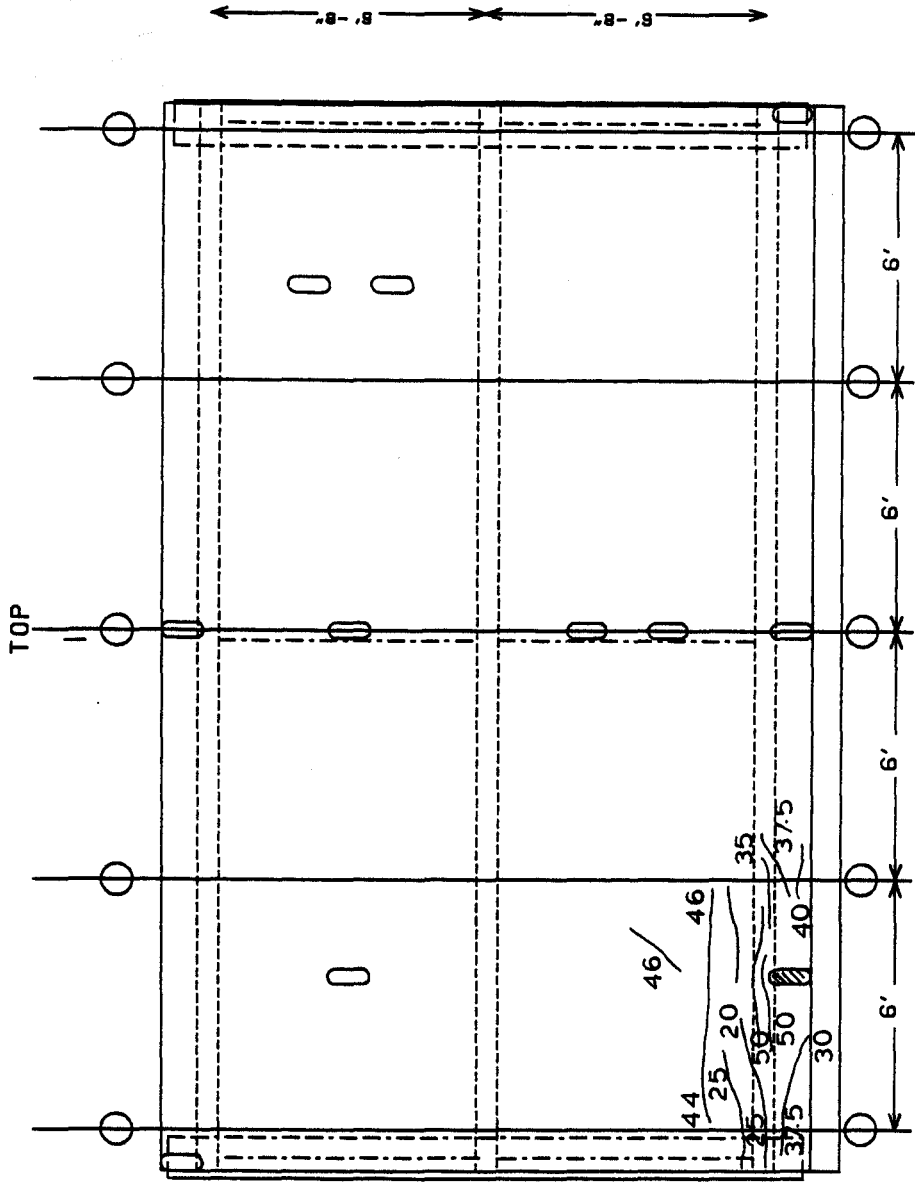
Top Cracking Pattern (First Bridge - Test No. 7)
